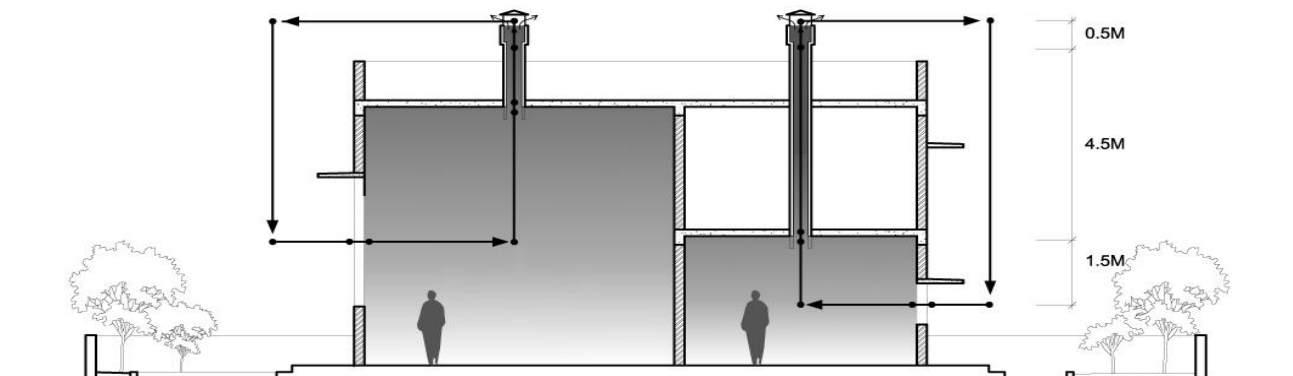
SECTION AA' THROUGH DOUBLE HEIGHT ROOF LIVING ROOM AND BED ROOM – CASE (C)
